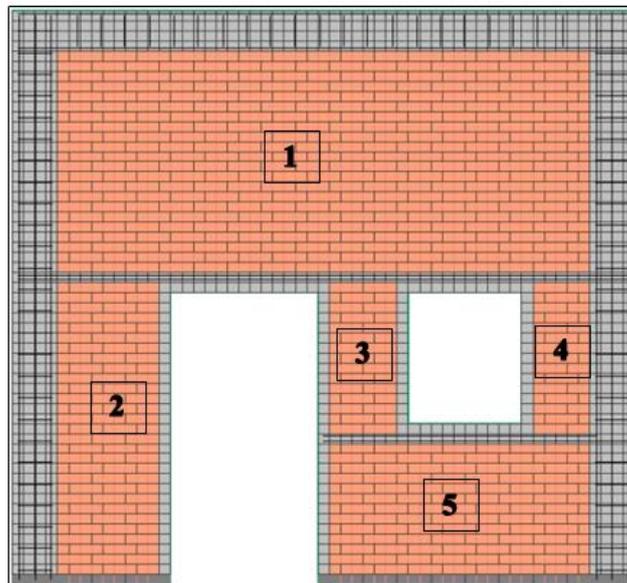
Horizontal reinforcement develops 5 strong components in wall
